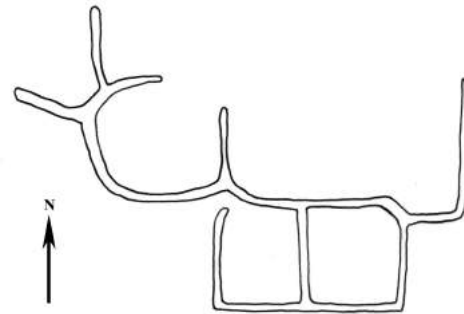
Site 22: Sketch plan of pisé walls (after Mills F.N. 1979b: 96).
